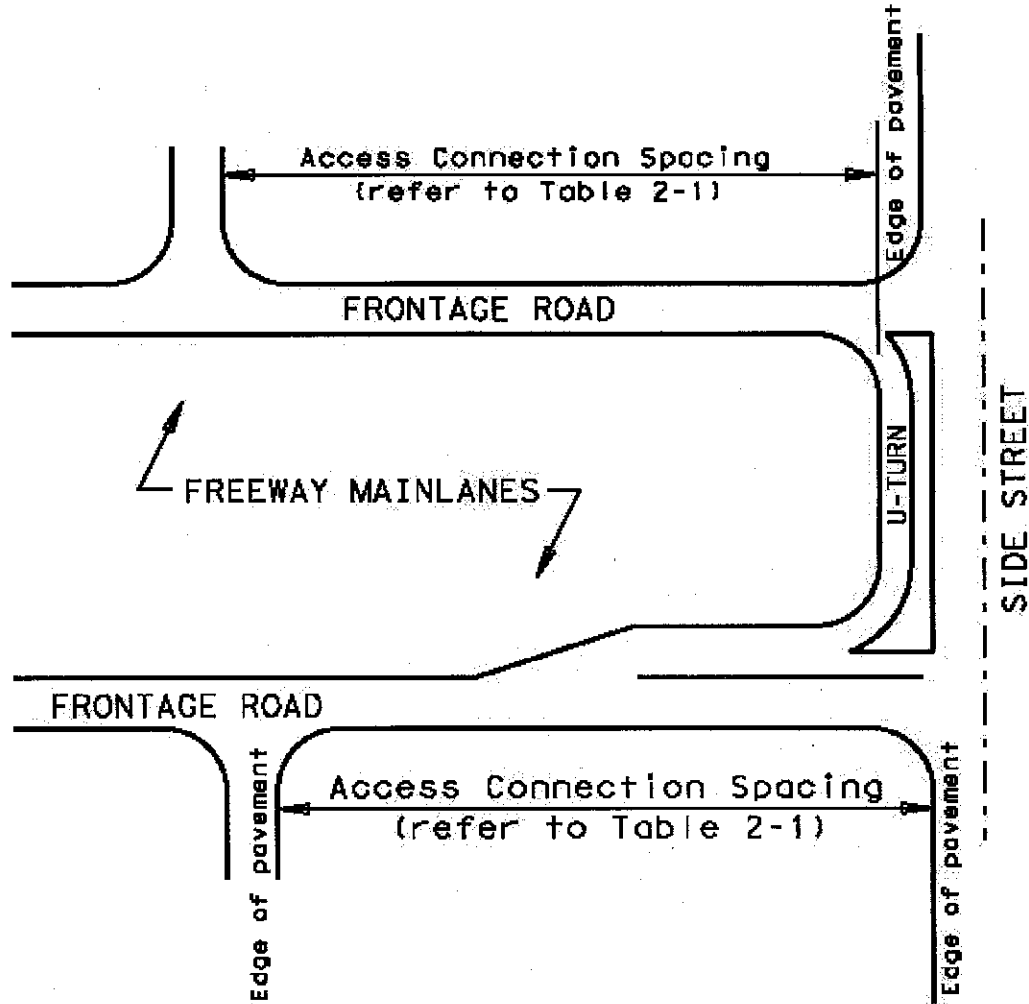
Frontage Road U-Turn Spacing Diagram
